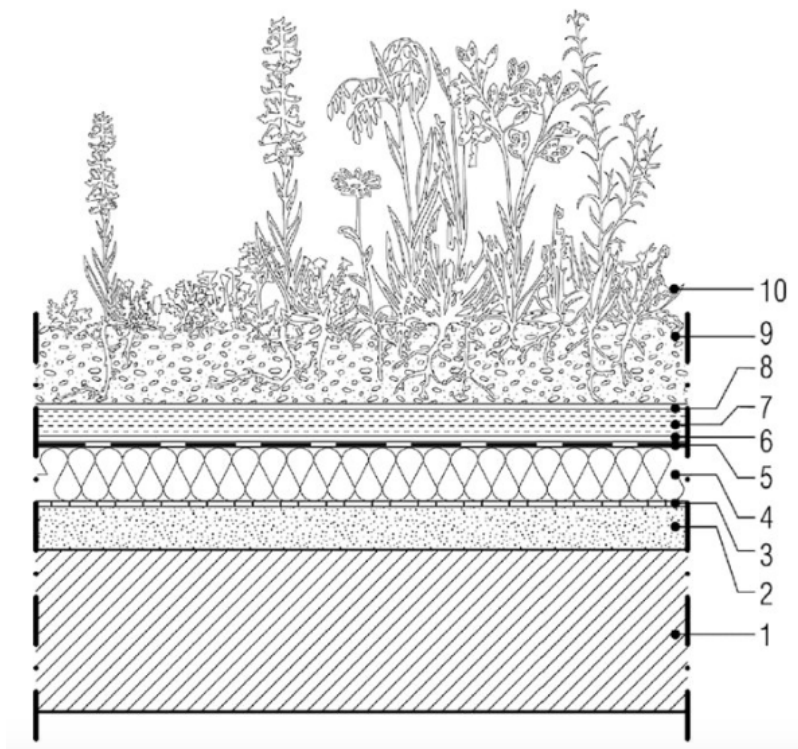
«typical construction of an extensive green roof In the drawing: 1) bearing structure, 2) draining slope, 3) vapor barrier, 4) thermic insulation, 5) waterproof membrane, 6) root barrier and mechanical protection, 7) drainage (and room for water storage), 8) filter, 9) vegetation supporting layer (and room for water storage) and 10) vegetation. The drawing was realised with Adobe Illustrator CS6 and was inspired by both the technical details and the drawings of the UNI 11235:2015 and the SIA 312-SN 564312:2013 standards” (Catalano et al., 2018, p. 17).
